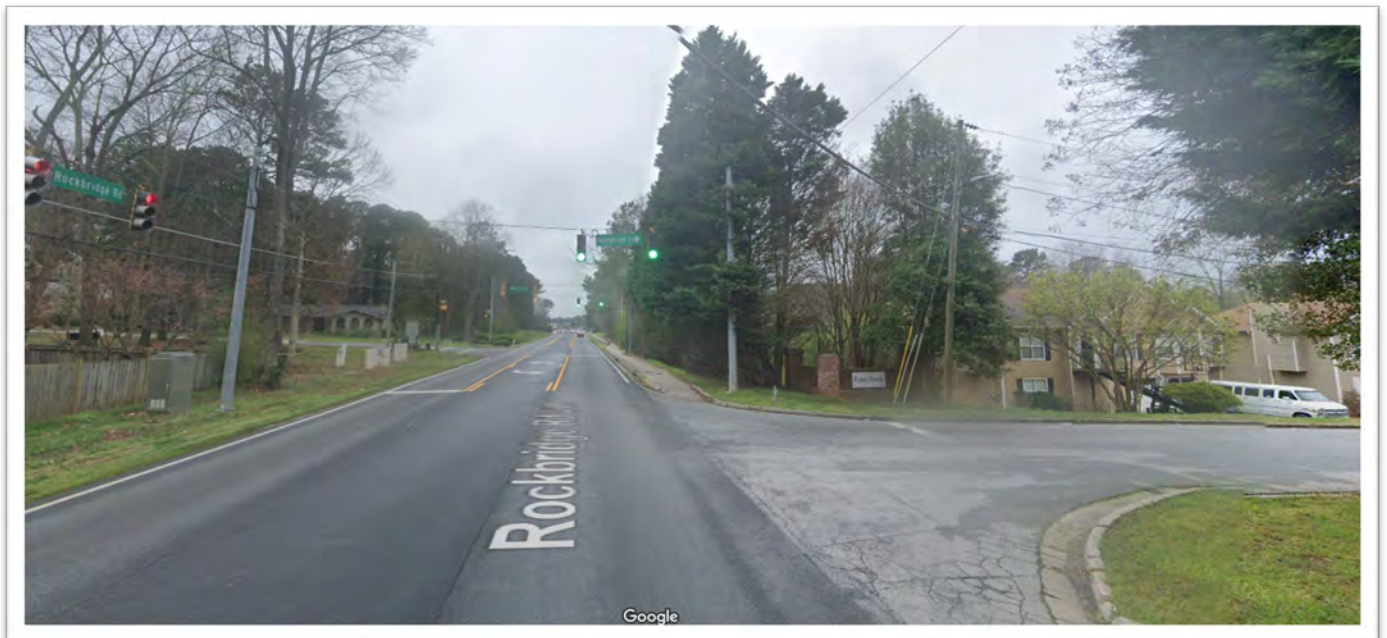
Street Conditions Signalized Rockbridge Rd and Pennybrook Lane Facing East
